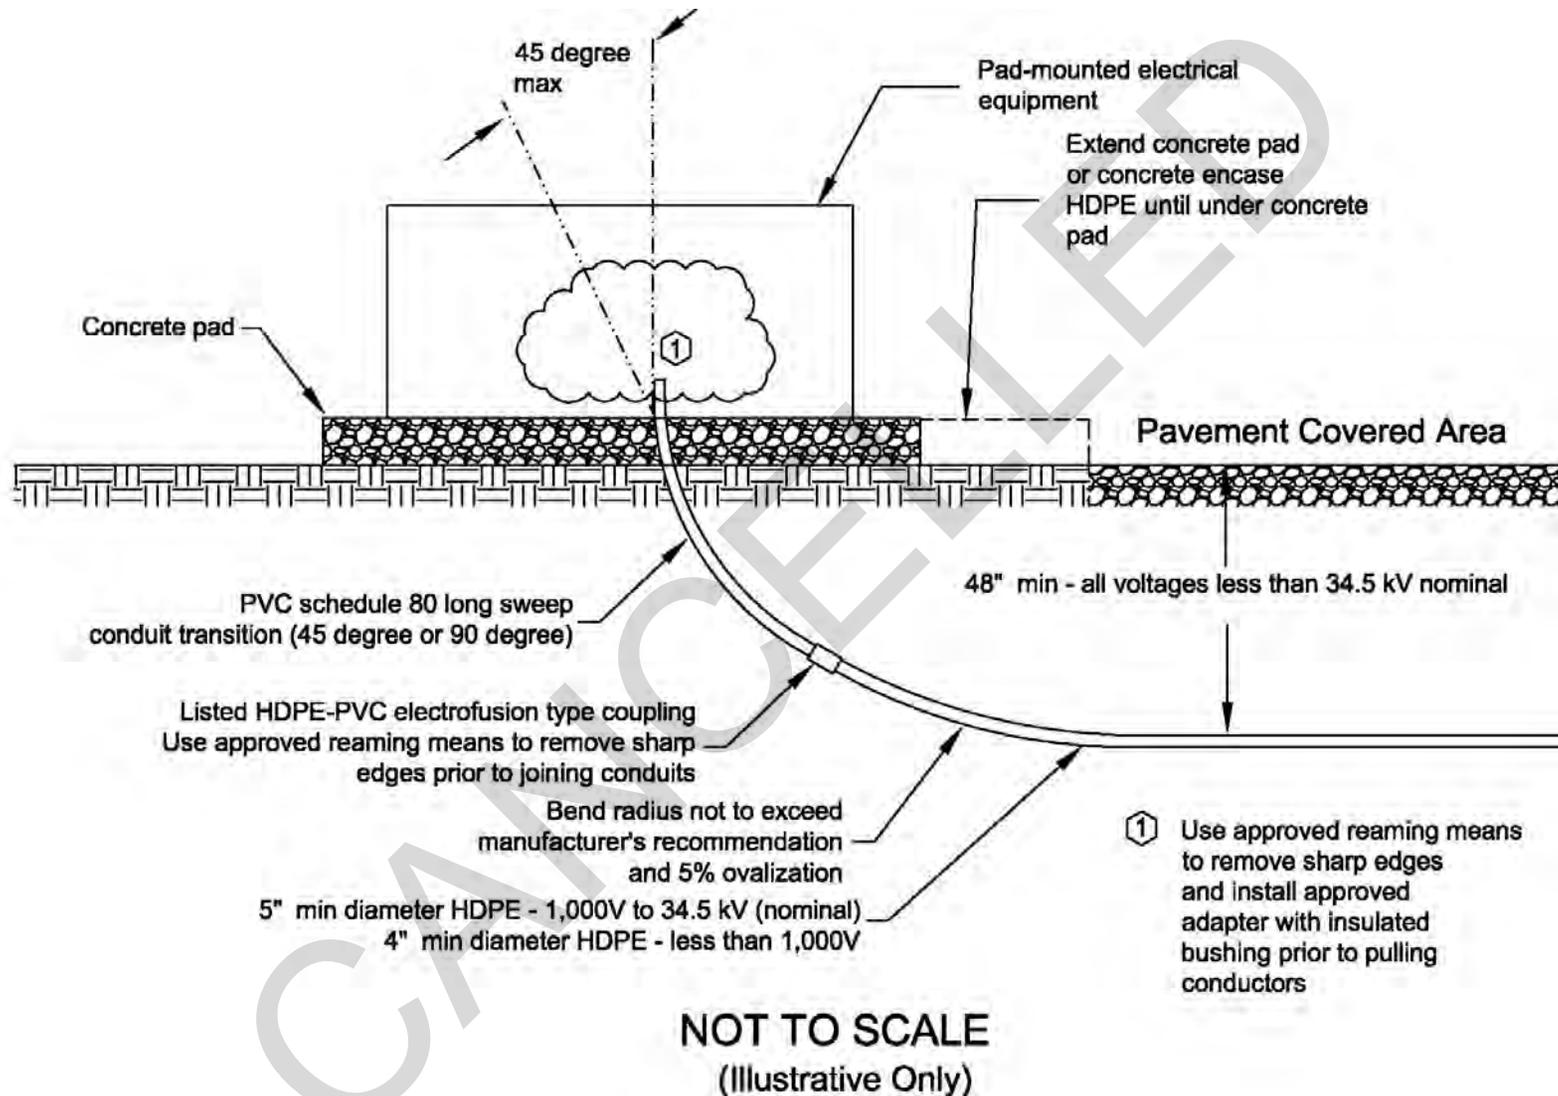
Pavement Covered Area to Electrical Equipment Transition – Rigid Conduit (45°–90°)
